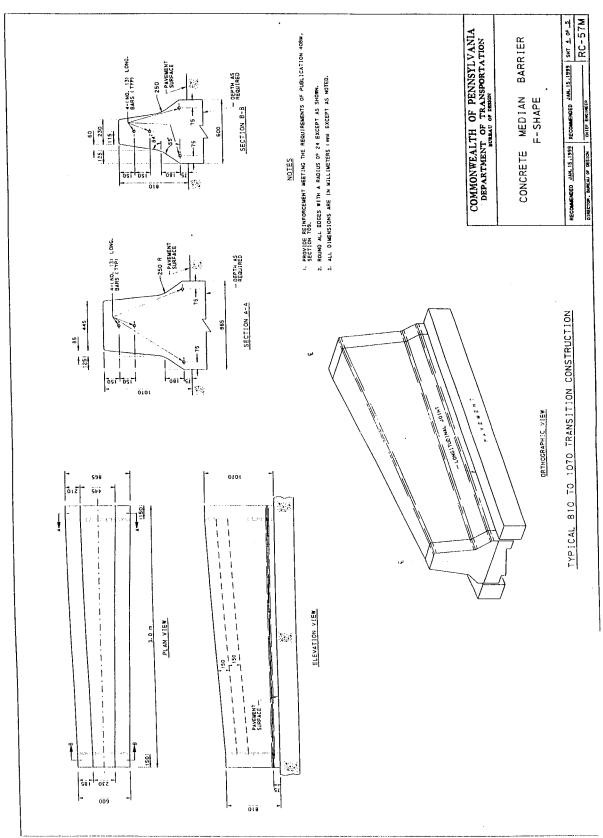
Detailed drawing of concrete median barrier F-shape (4 of 5).
